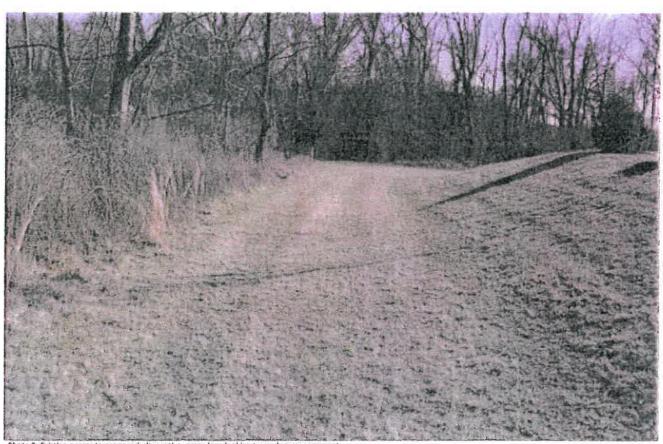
Existing access to proposed alternative, grass lane looking toward sewer easement
